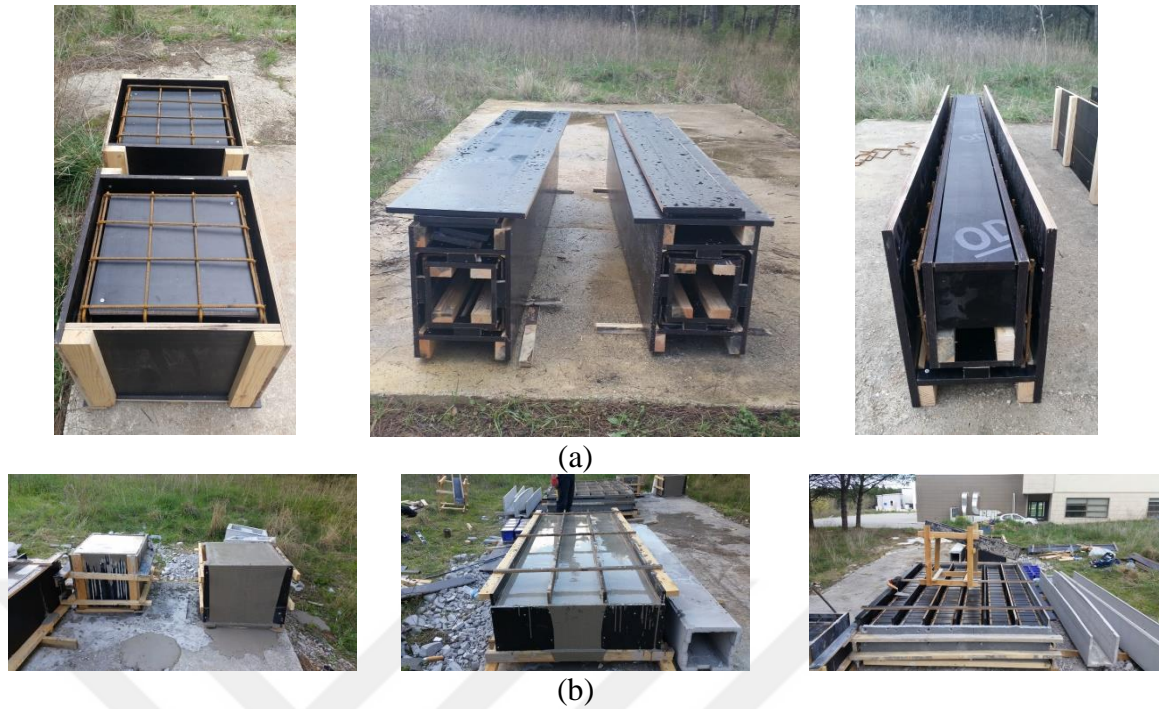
RC formworks for bases, columns, and beams. (a) Preparation (b) Products.
